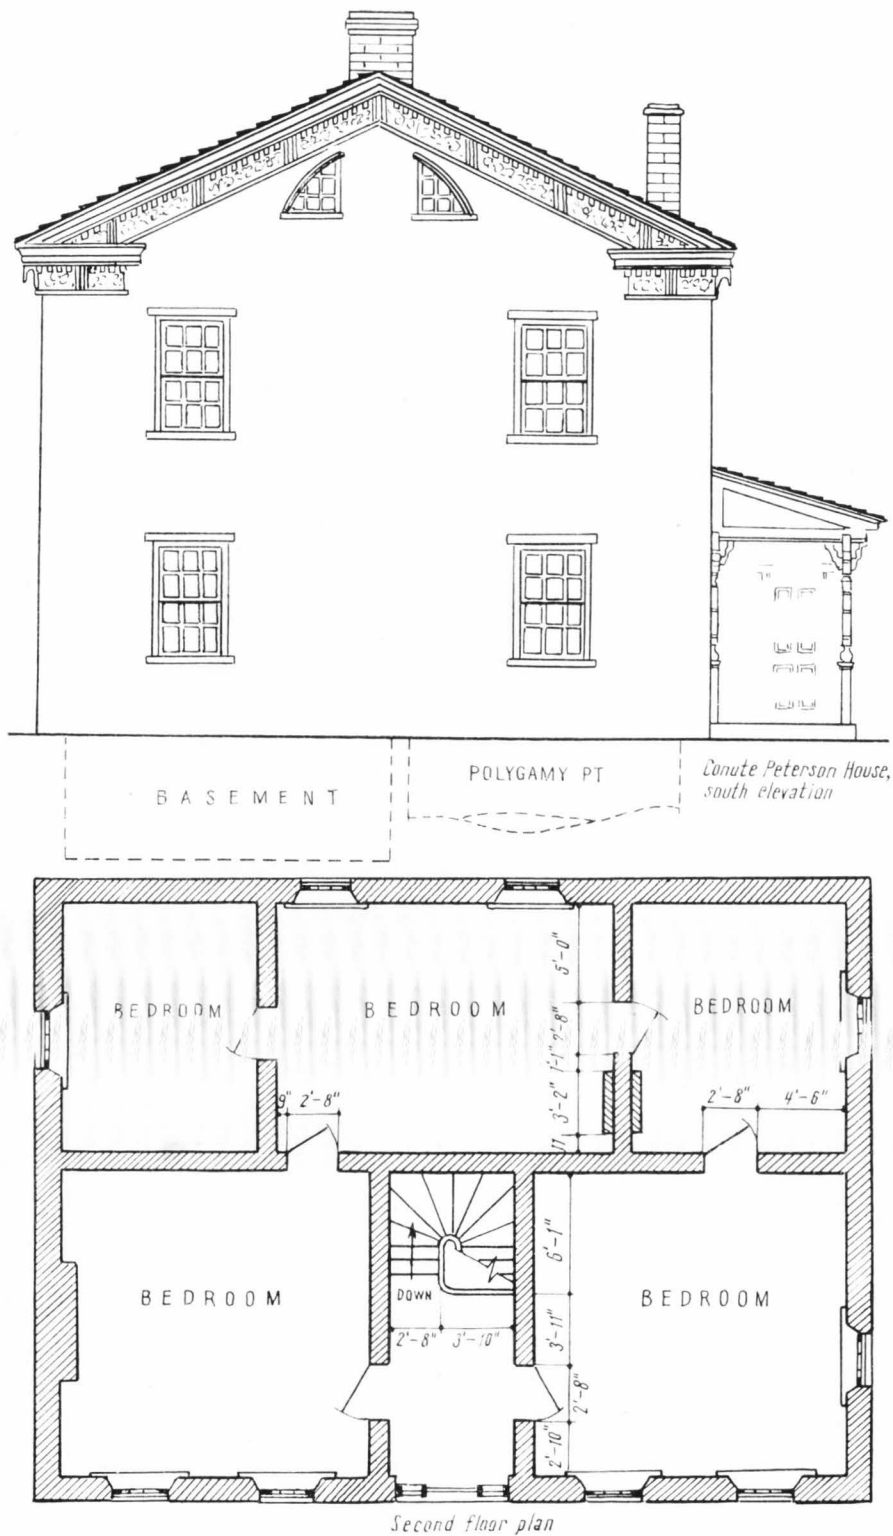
Side elevation and second floor plan of Canute Peterson house, Ephraim.
